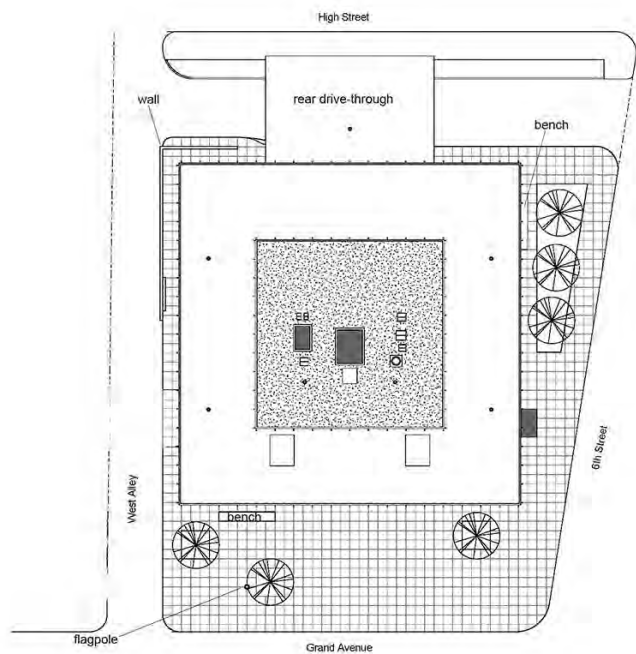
Home Federal Building site plan. (Brooks Borg Skiles AE, 2014, with 2015 revisions by author)
